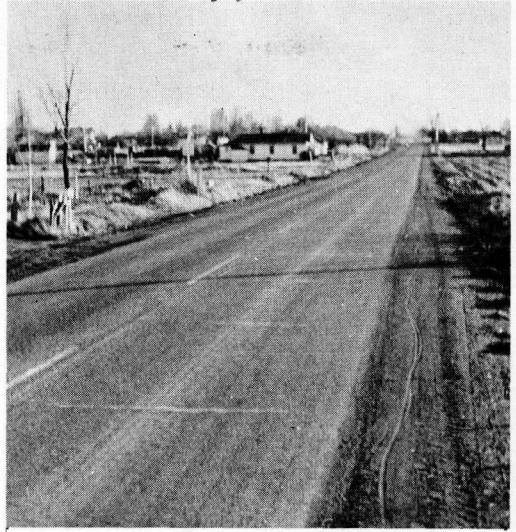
Resurfaced portland-cement concrete pavement with no added base.
